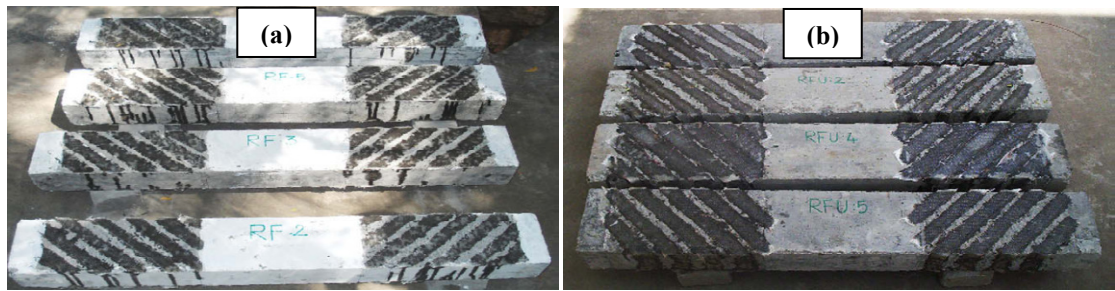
GFRP-strengthened beams using inclined (a) side strips and (b) U-strips (Sundarraja & Rajamohan, 2009)
